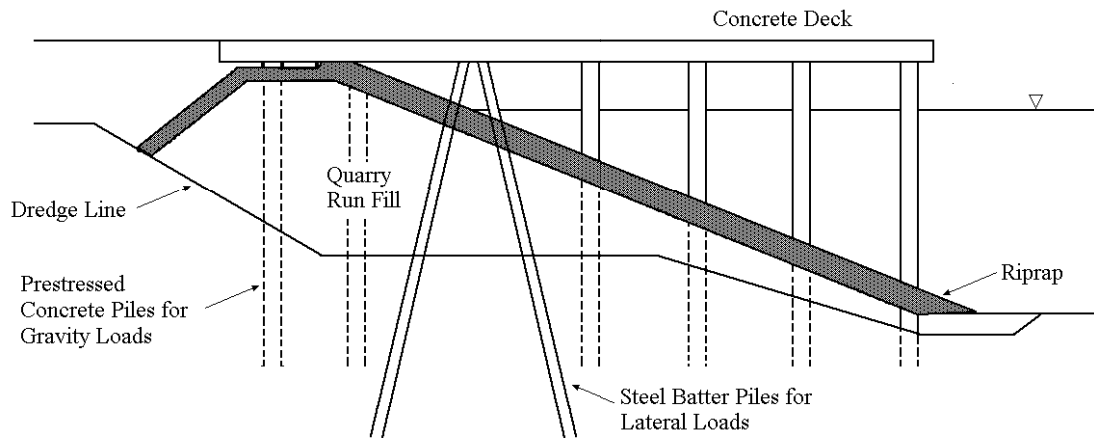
Schematic of Typical Wharf Section with Steel Batter Piles
